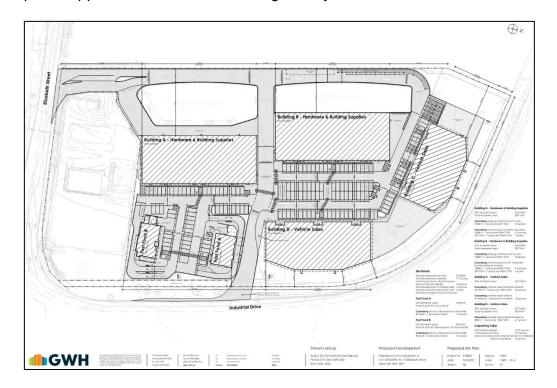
Current proposal - Elizabeth Street and Industrial Drive left in only access.
